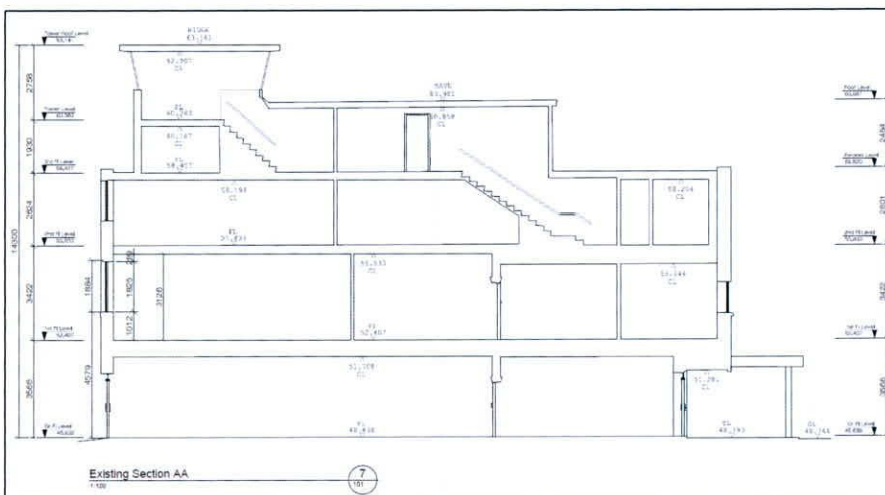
Drawing P937-101 Existing Section (Source: NBK)
